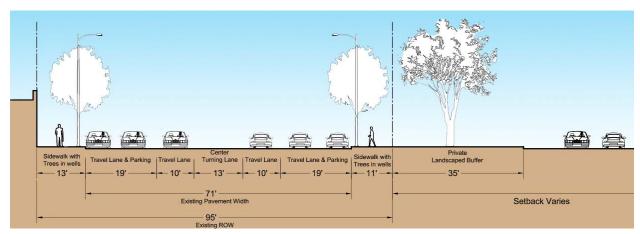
Typical Cross-Section along Sierra Avenue (south of Fontana Metrolink Station) in the City of Fontana
